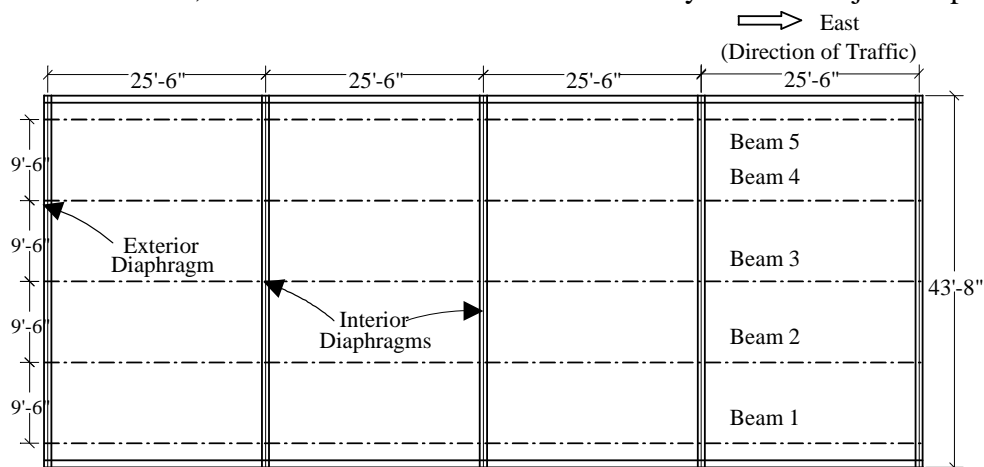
Plan View of the Instrumented Span at the Nolanville Bridge
